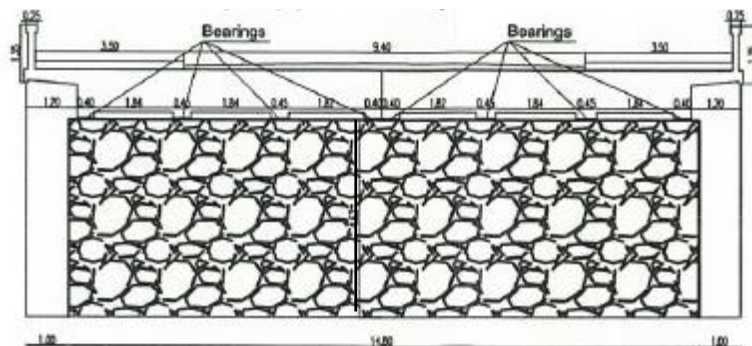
Longitudinal view of exterior wall and cross section of deck slabs (section 2-2)
